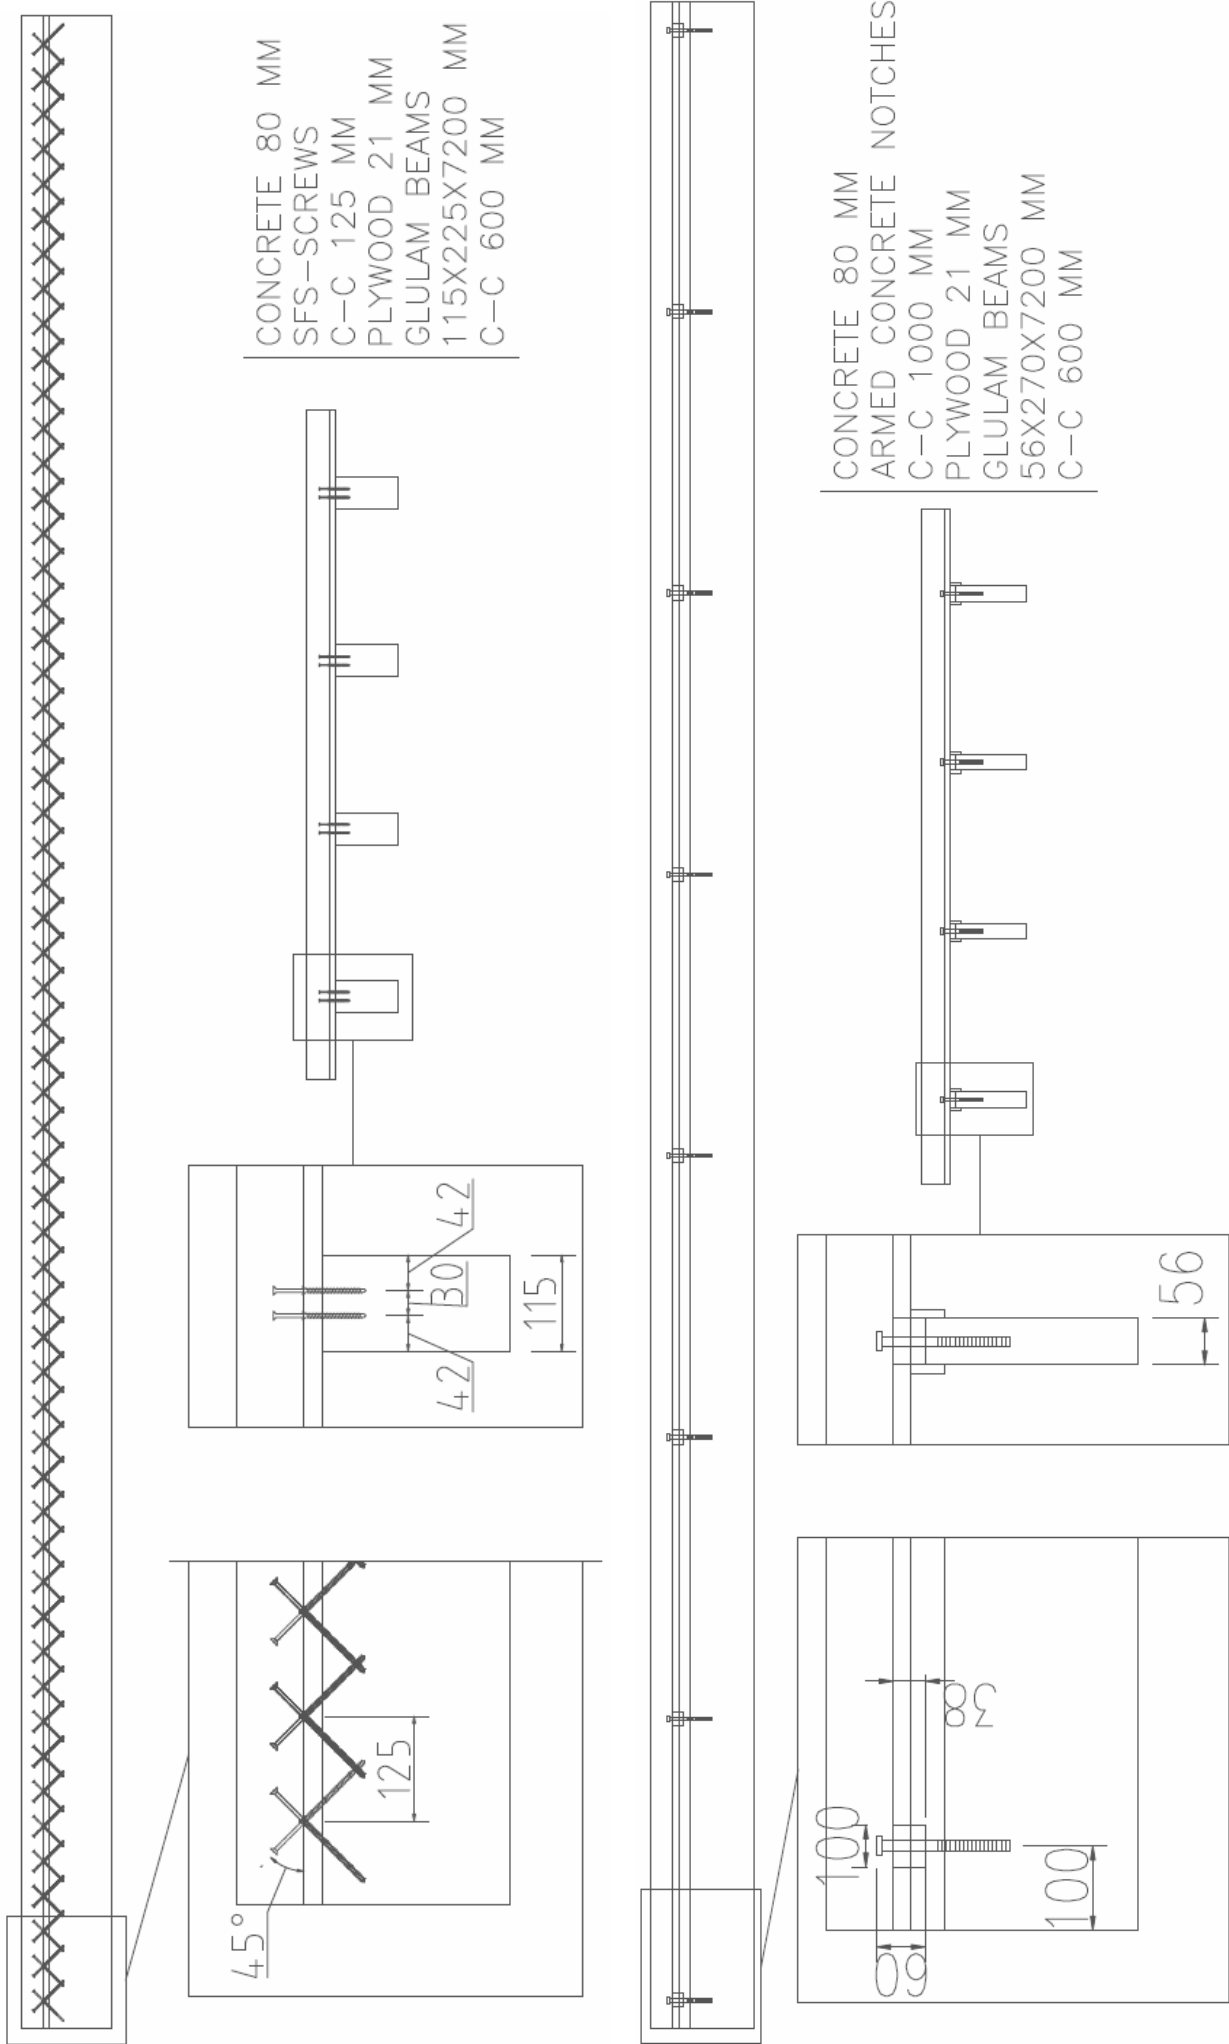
Top: Test specimen with SFS-connectors. Bottom: Test specimen with concrete notch-type connectors
